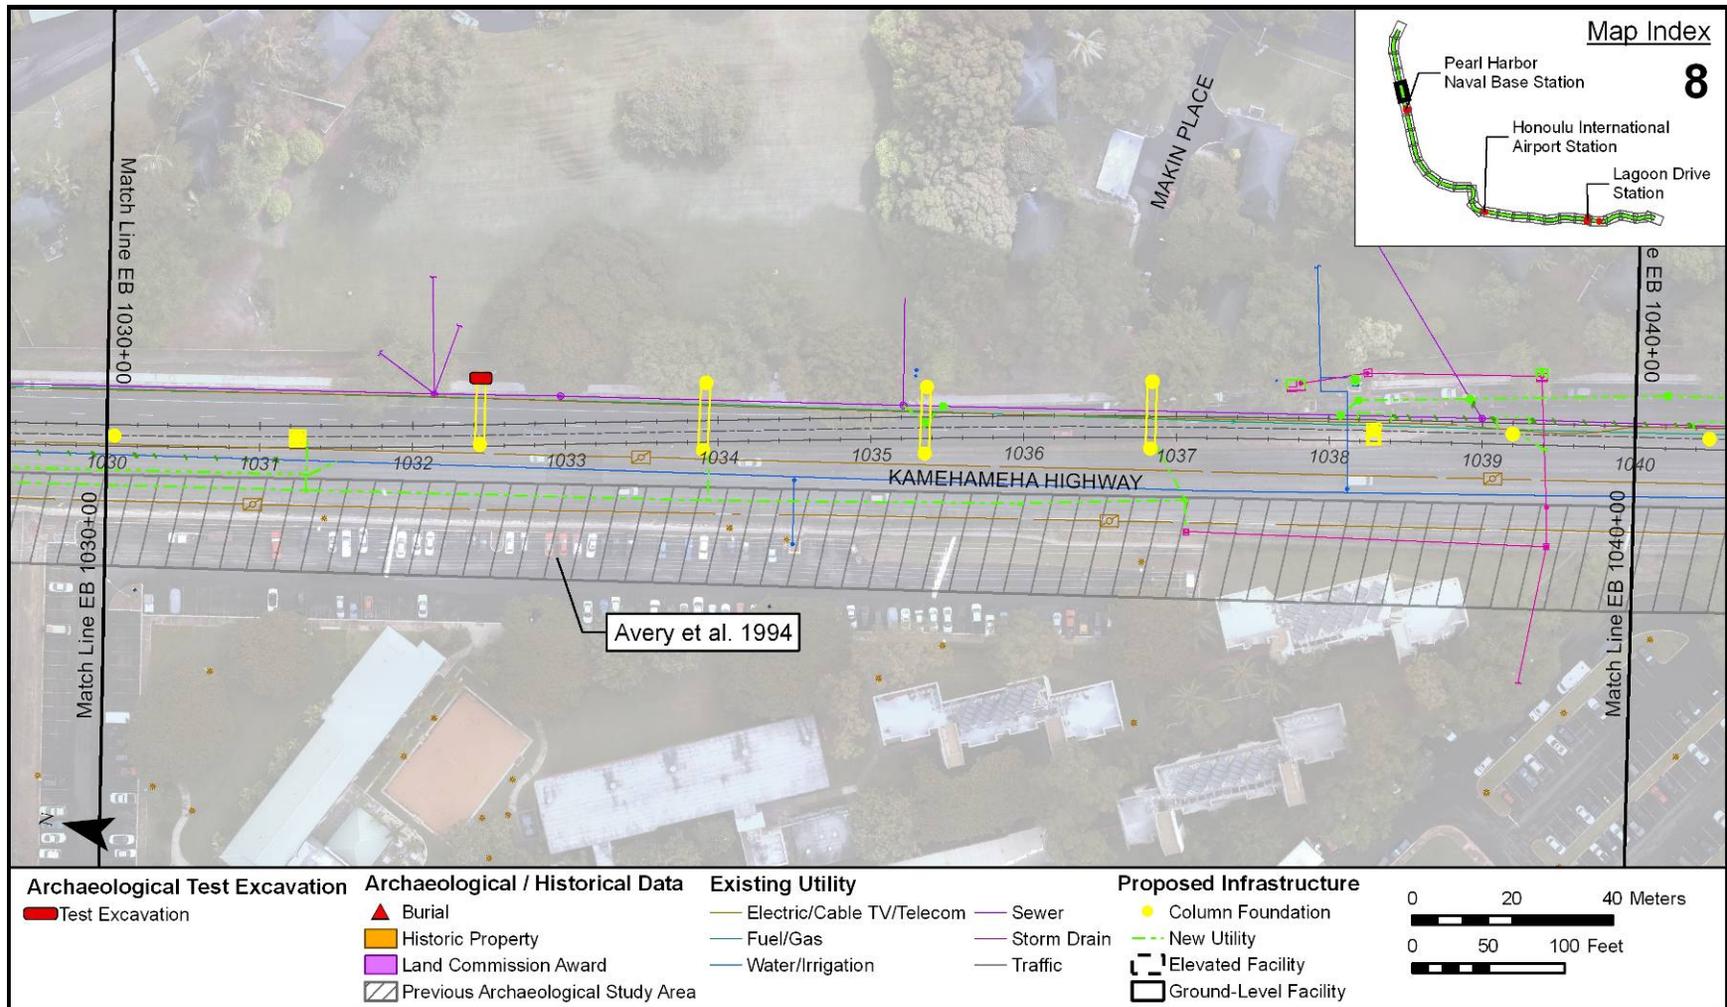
Map Sheet J 8, one 10x3 excavations at mauka Column foundation @ 1032+40
